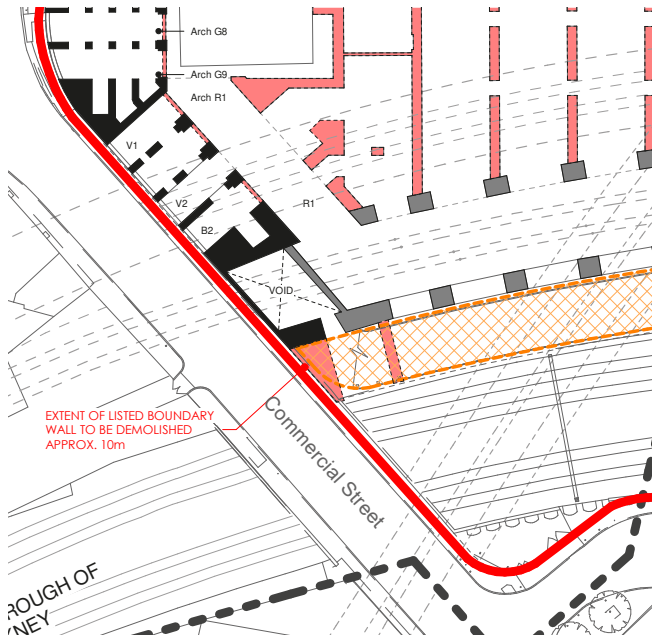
Demolition drawing showing section of wall to be removed
